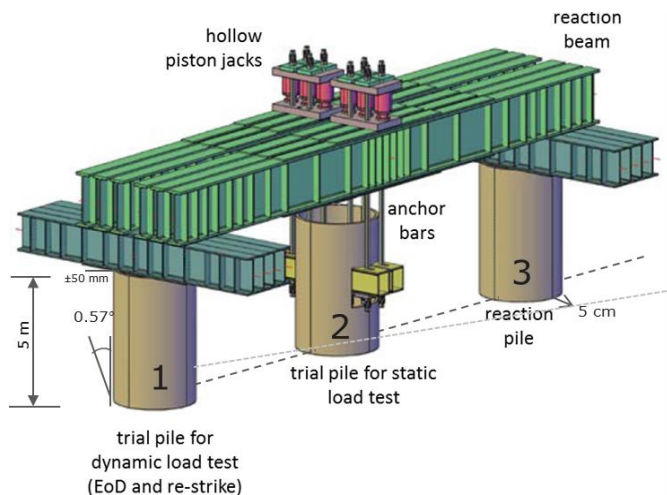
Schematic of Wiking static testing arrangements; after Jardine (2020).
